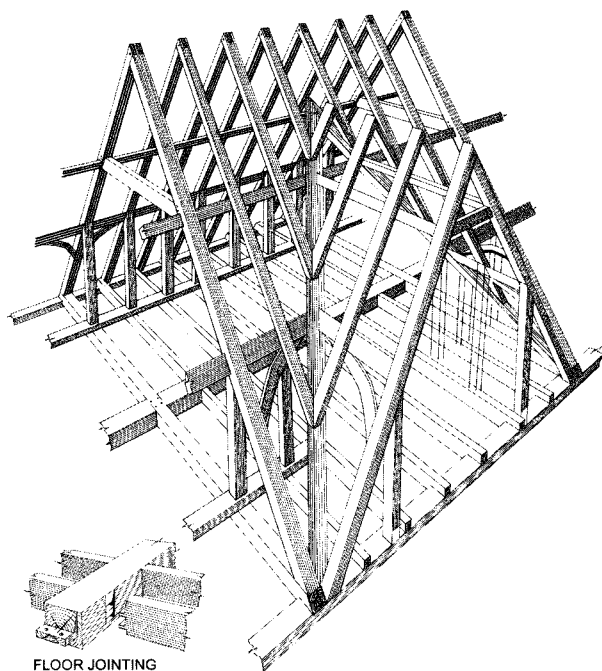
Rochford Hall, roof construction in the Golf Club attics (Cecil Hewett).
